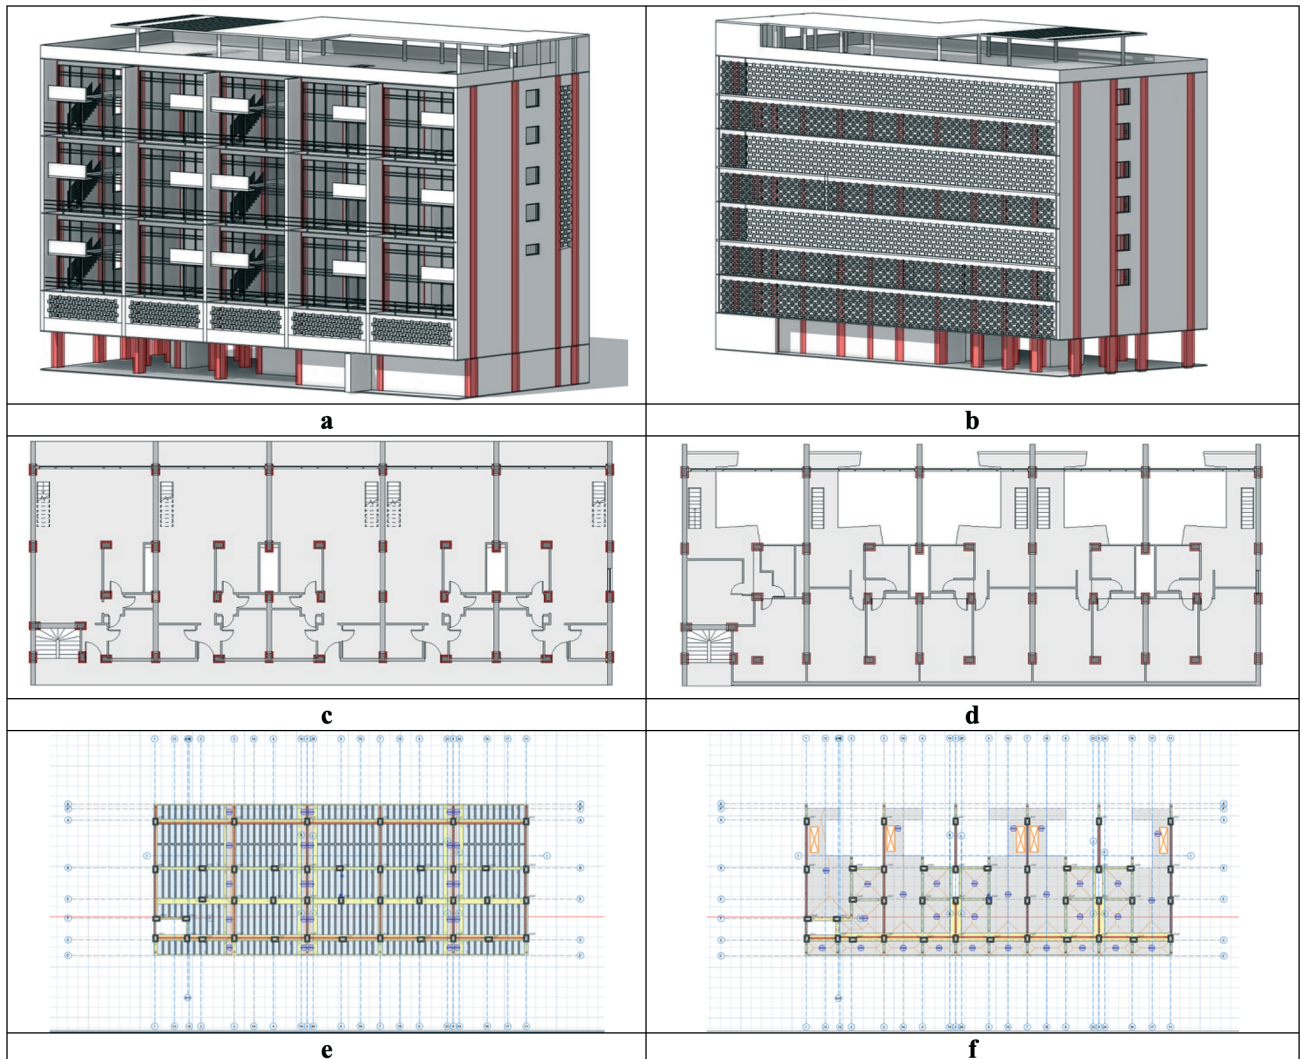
Model 2 – Column-jacketing: a. Perspective views from northwest façade. b. Perspective views from southeast façade. c. Residential unit's entrance floor plan. d. Residential unit's mezzanine floor plan. e. Residential unit's entrance floor ProtaStructure model. f. Residential unit's mezzanine floor ProtaStructure model (3-D images are produced by authors via Autodesk Revit Software; 2-D images are produced via ProtaStructure Software).
